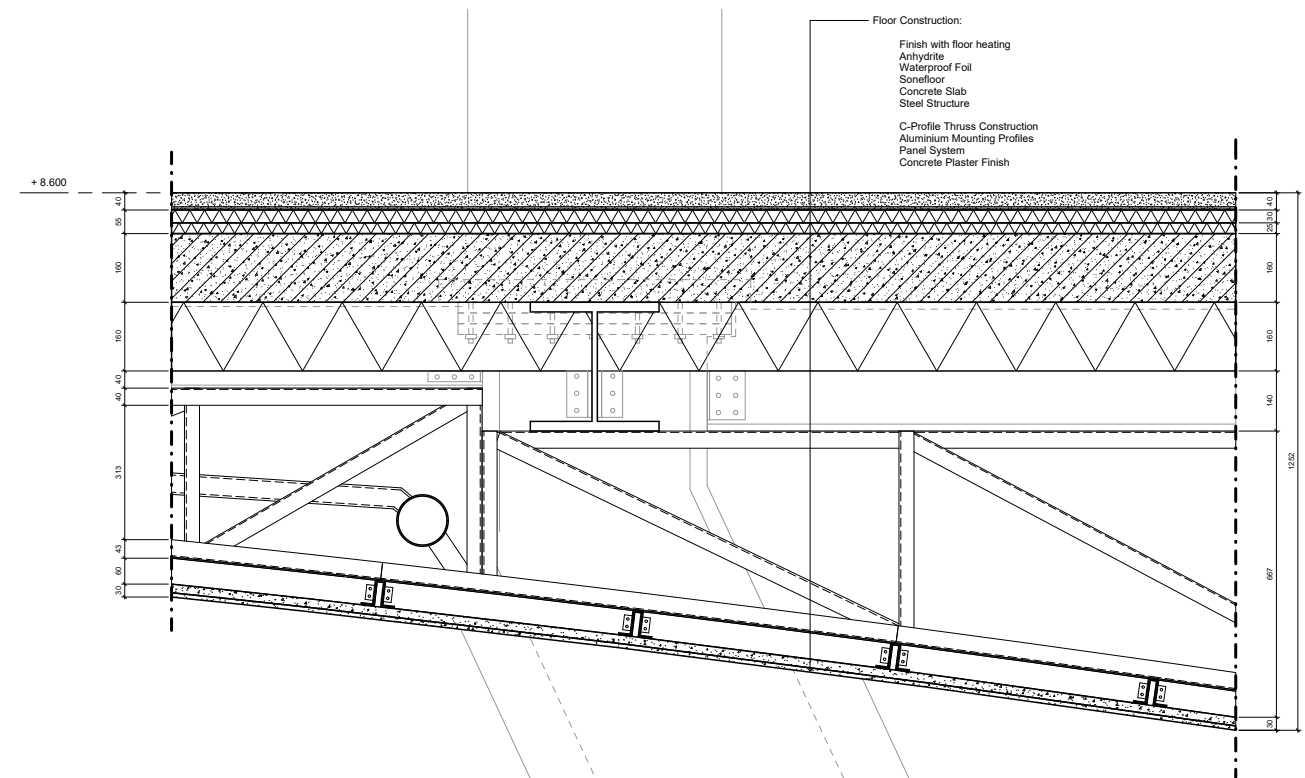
Connection detail of the V-Supports with the Canopy and the extension of the Building
